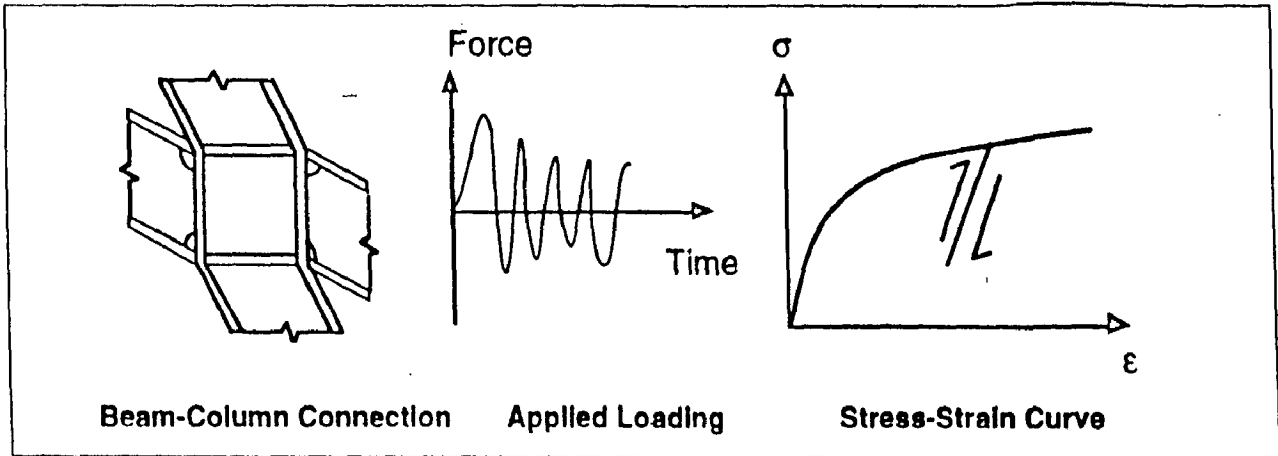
Loading and Unloading of Beam Column Connection under Dynamic Loading
